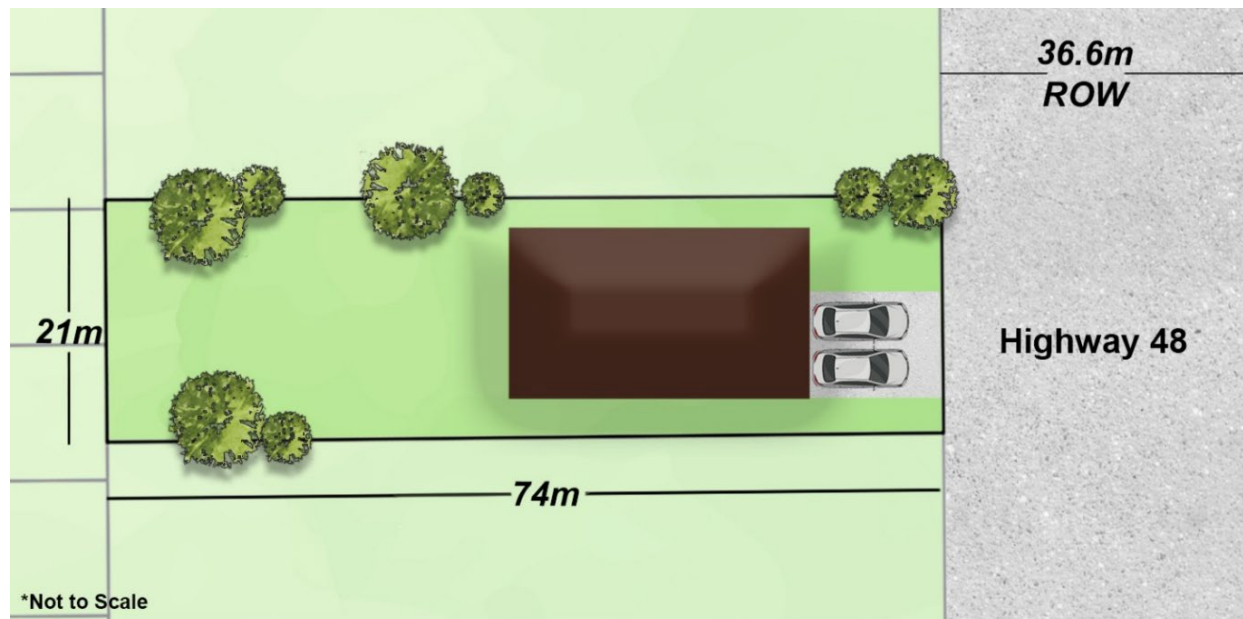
Interior Lot with Frontage on Highway 48 Concept Plan
